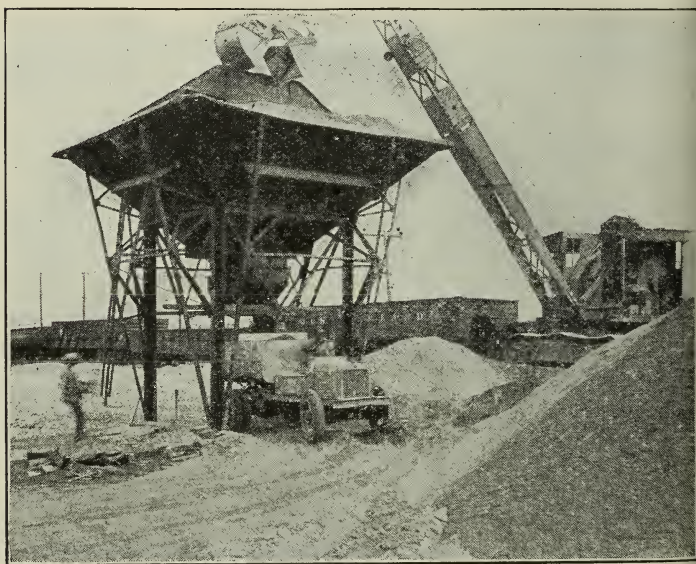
Proportioning and loading materials for Portland cement concrete pavement
